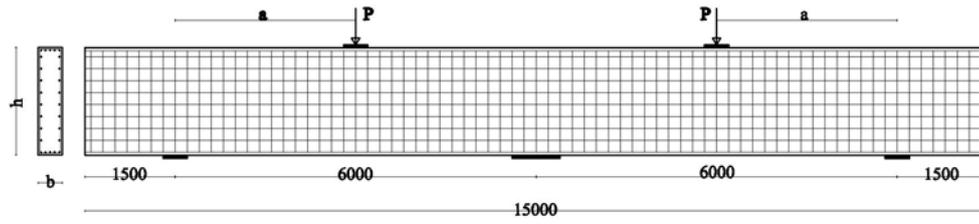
Details of the typical beam used for parametric study (mm.)
